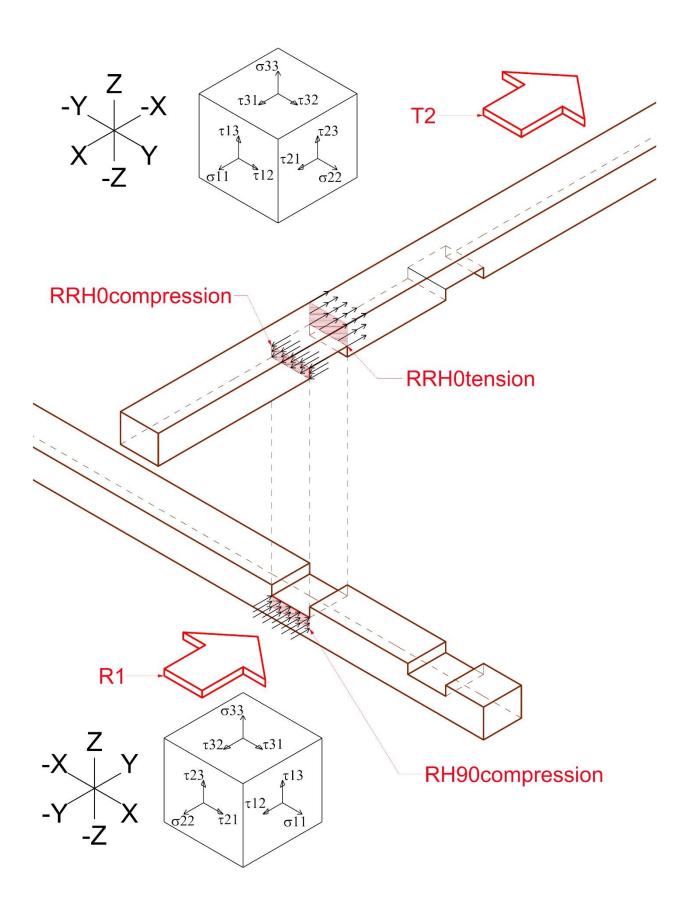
Roof Rafter Head Axial stresses: Crossing rafters T2-R1
